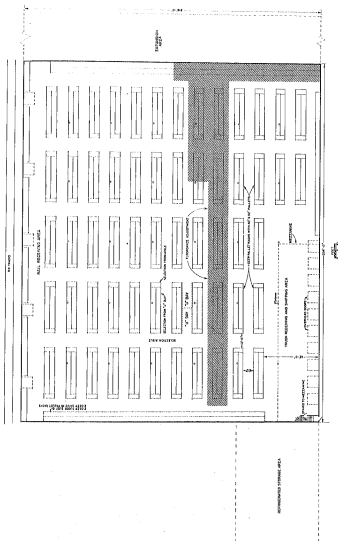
Warehouse layout for "U" bay selection with floorspace adjustment.
